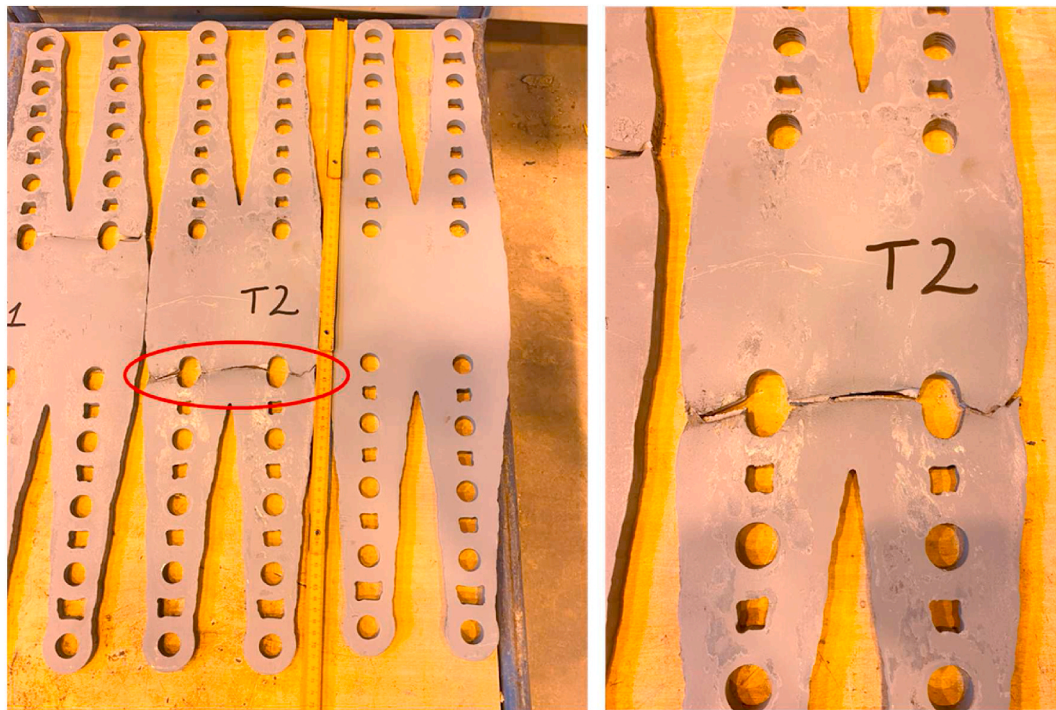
Failure of specimen T2 extracted from the testing machine.
